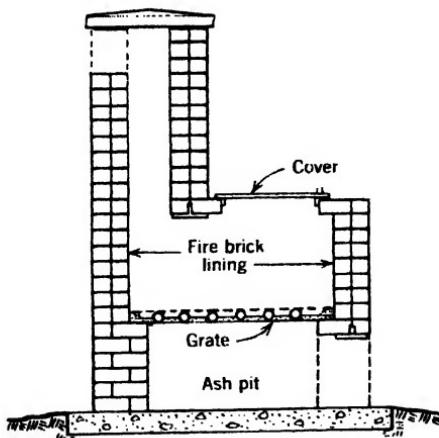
An incinerator constructed of masonry. The firebox and chimney should be lined with firebricks. The outside can be of bricks, stone, or building blocks. The grate is made of heavy expanded metal resting on lengths of old pipe or rods set in a thin layer of mortar at the ends. A wire basket can be hung on the inside for drying and eventually burning wet garbage.
